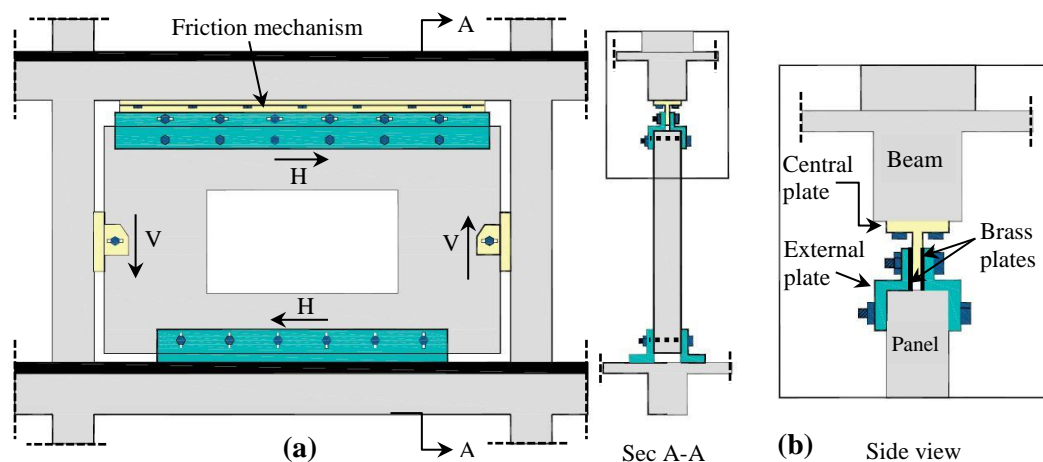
Schematic model of a wall damper: (a) application in RC frame, and (b) friction connection detail (adopted from Petkovski, 2001)
